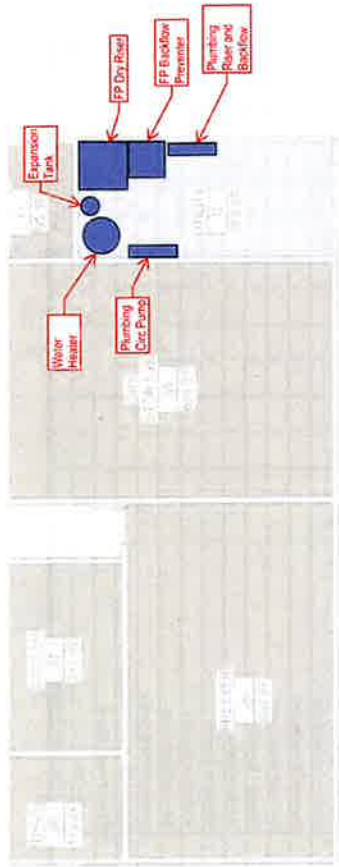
ANIMAL CARE BUILDING PLUMBING EQUIPMENT
